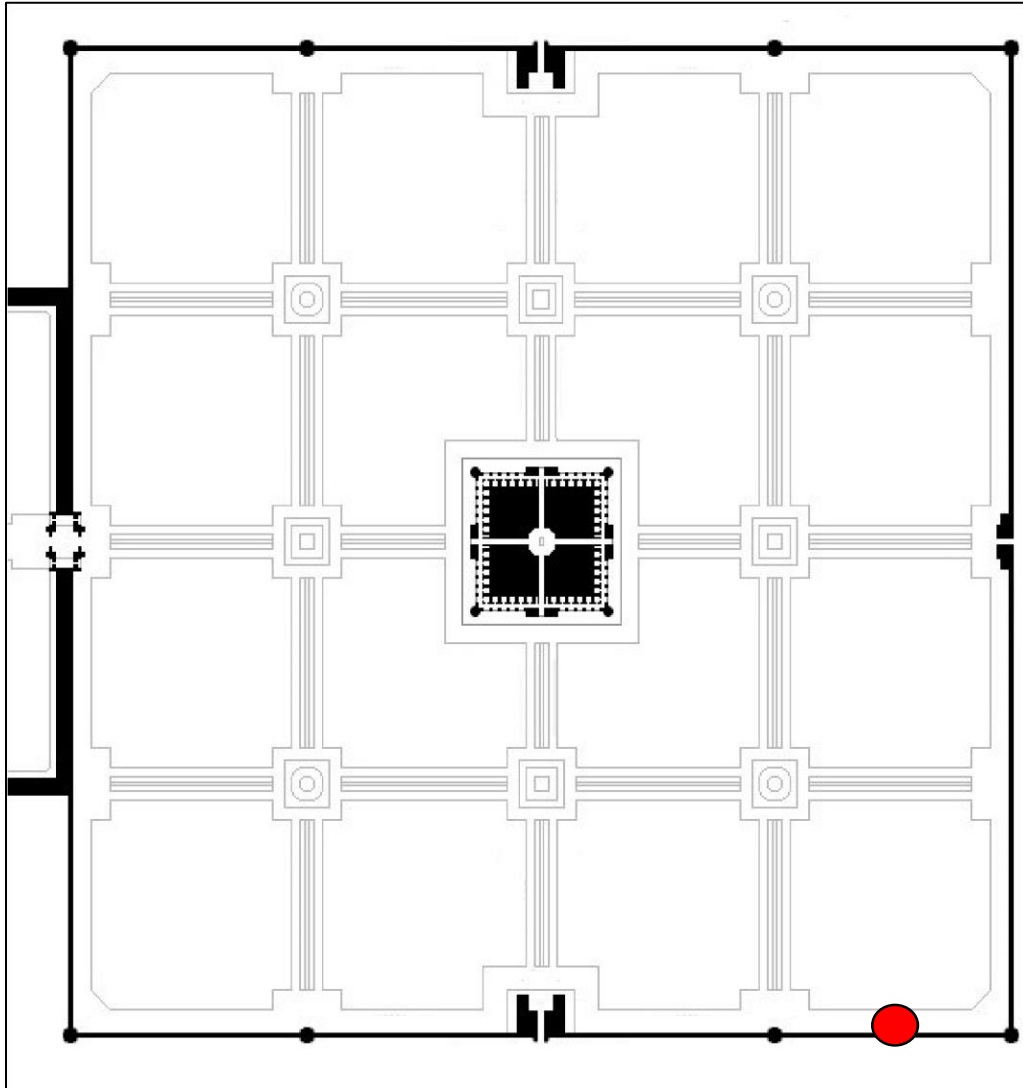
Jehangir Tomb, Lahore: Layout Plan and sampling area (encircled) (After KKM)
